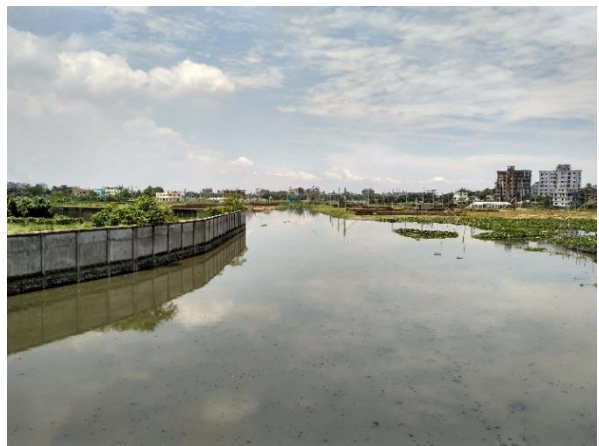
Matikata road near kalshi road (Canal existing cross section)
